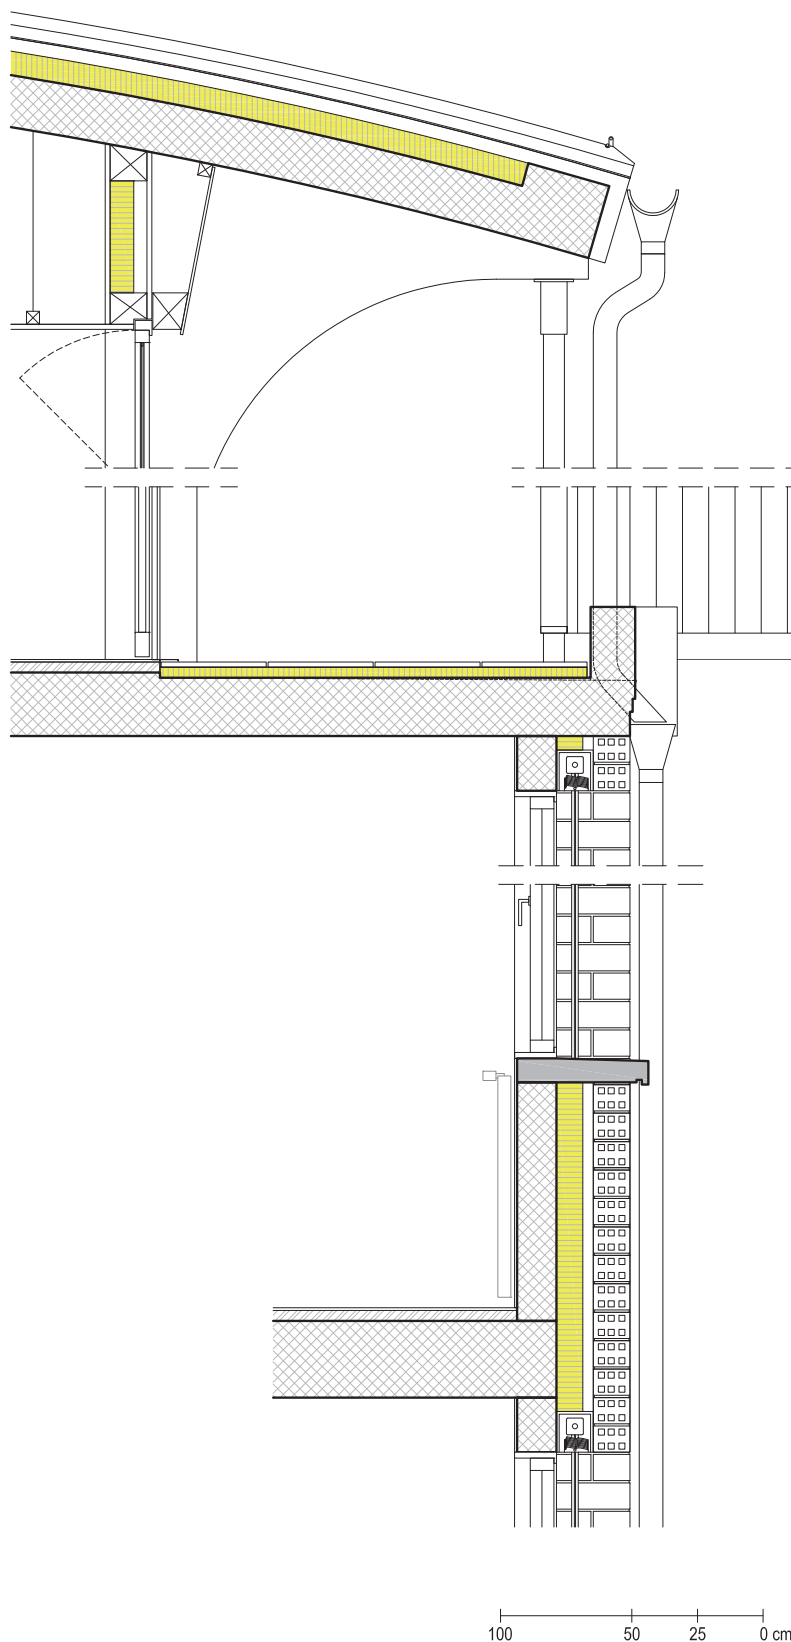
Façade and roof constructive detail, E0 – Current Status, Archetype 5.
